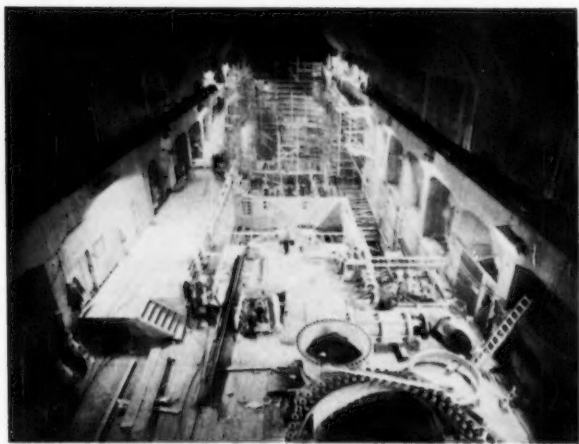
BERSIMIS No. 1 SECOND STAGE CONCRETE
